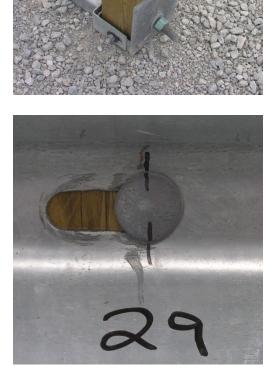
Downstream Anchor Damage, Test No. MGSSYP-1
